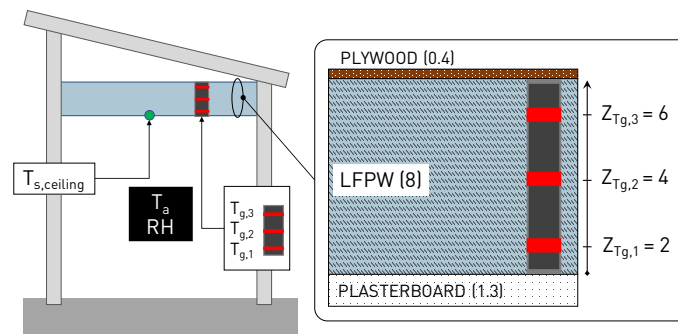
Details of the LFPW wall and sensor placement (dimensions in cm).
